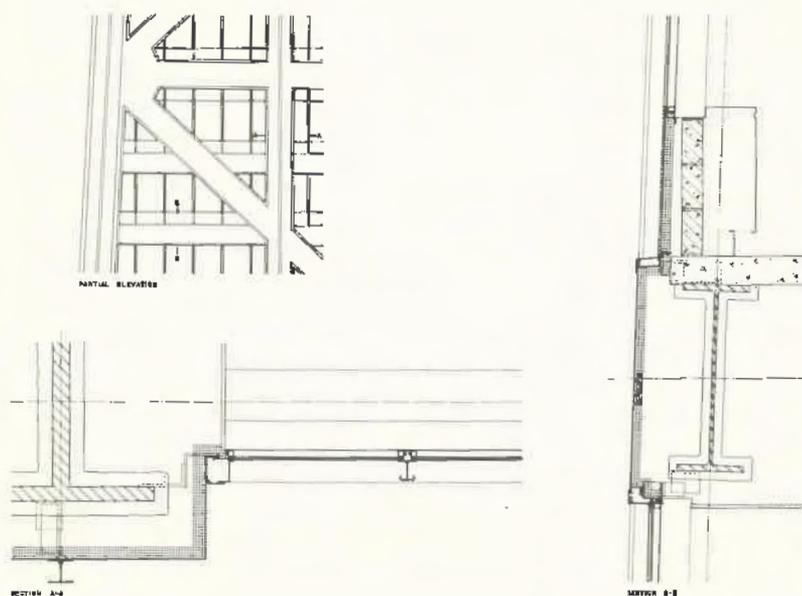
Detail of Cladding, Insulation and Fireproofing
